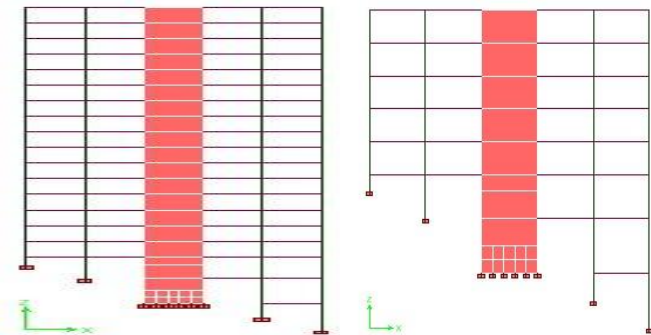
G+15 and G+4 Storey Building, 27° Ground slope
